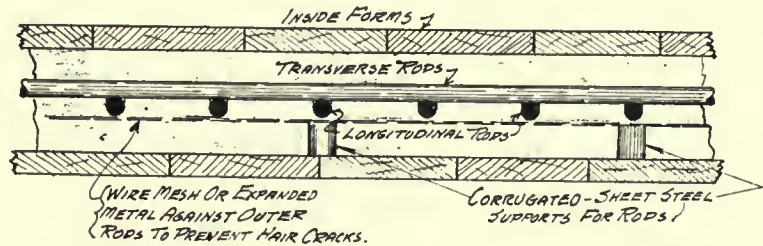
METHOD USED IN HOLDING RODS IN PLACE FOR POURING FORMS
